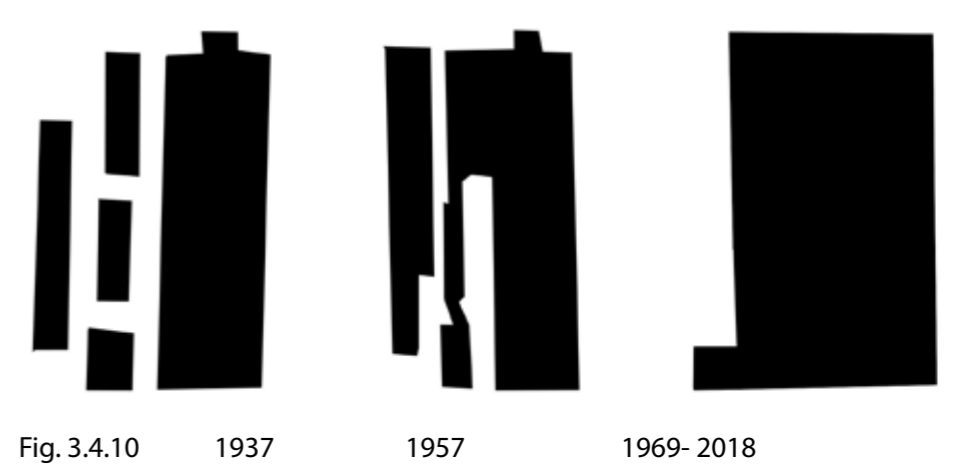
Building 436 floor size and shape through time, masses of 1937 and 1957 were completely demolished in favor of building 436
